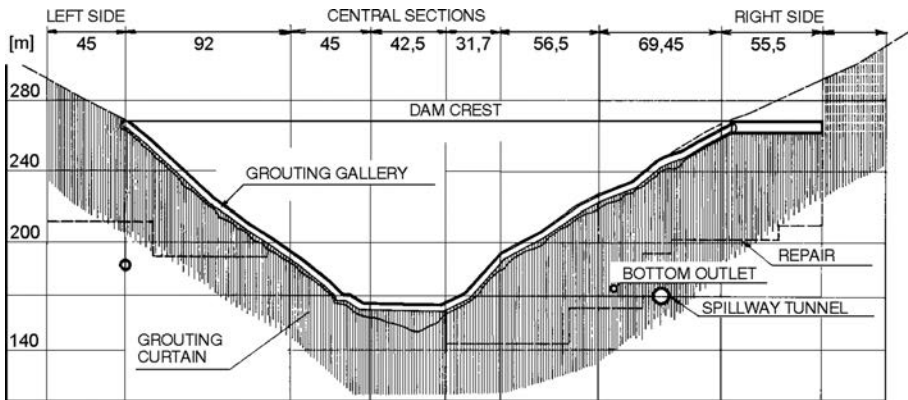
Unfolded section along the grout curtain at the Tikvesh dam.
